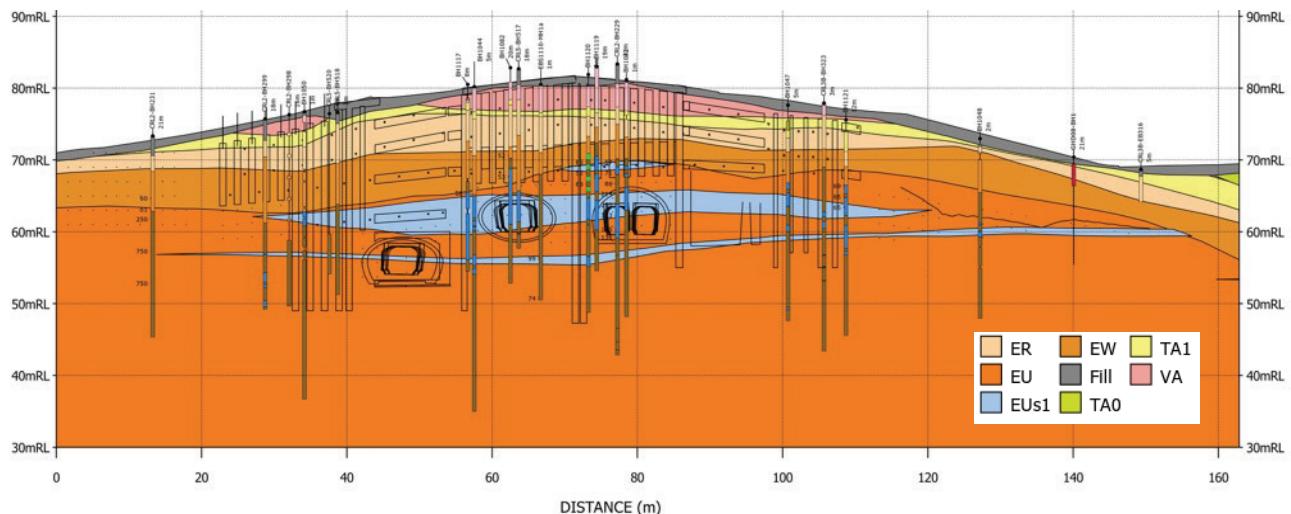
Geological model used for design through section cut along portal wall alignment, uncemented sandstone layers shown in blue.
